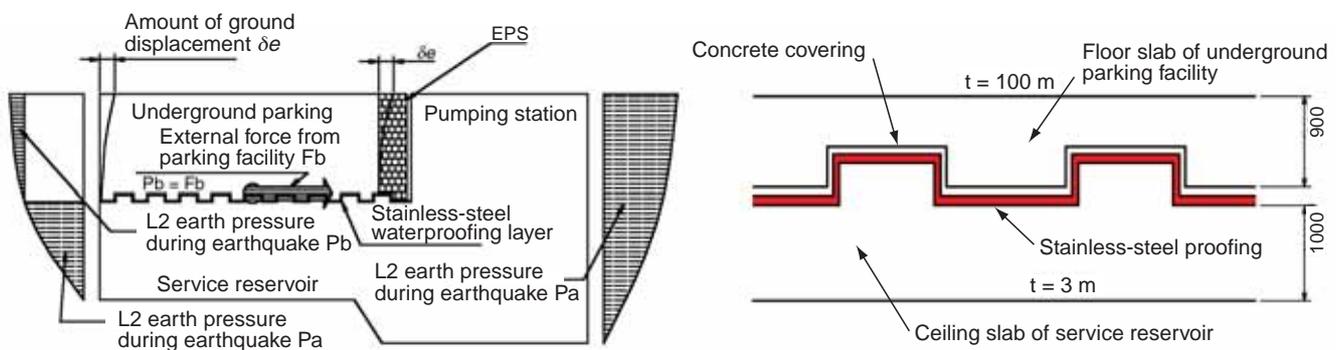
Cross-sectional views of EPS backfill and stainless-steel waterproofing structures
